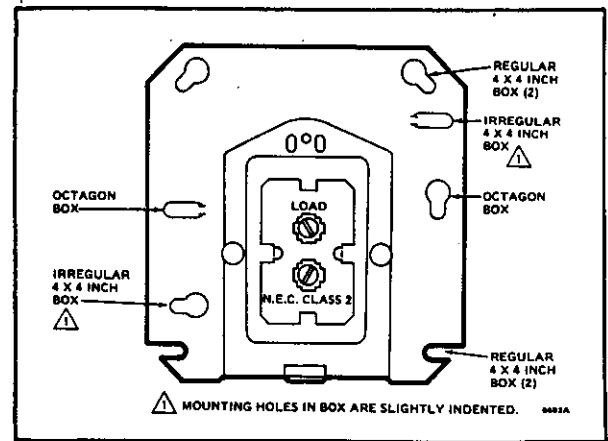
LOCATION OF MOUNTING HOLES IN PLATE.
